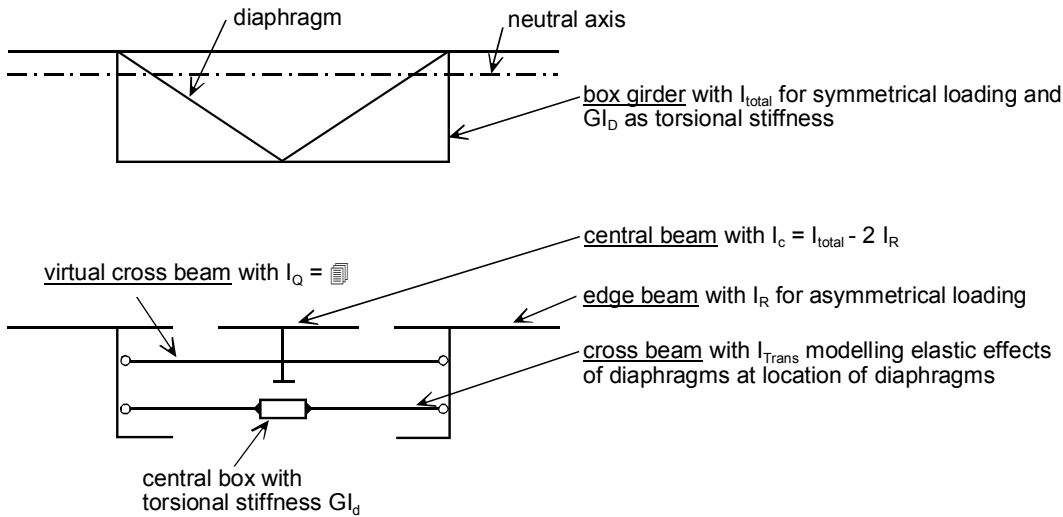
Modelling of box girders by a central beam (I_c) and two edge beams (I_R)
